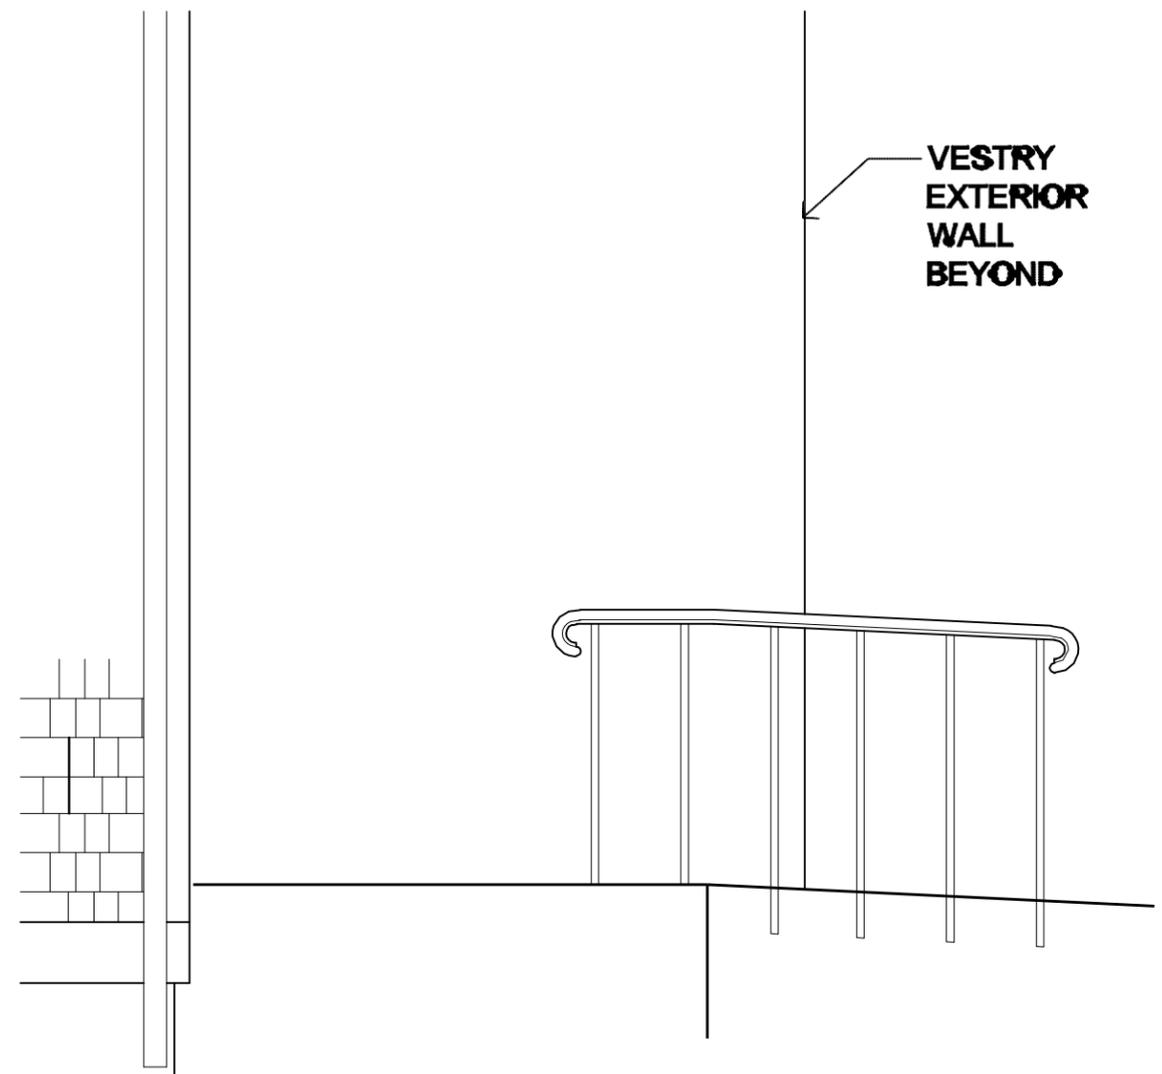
SOUTHWEST (FRONT) ELEVATION
